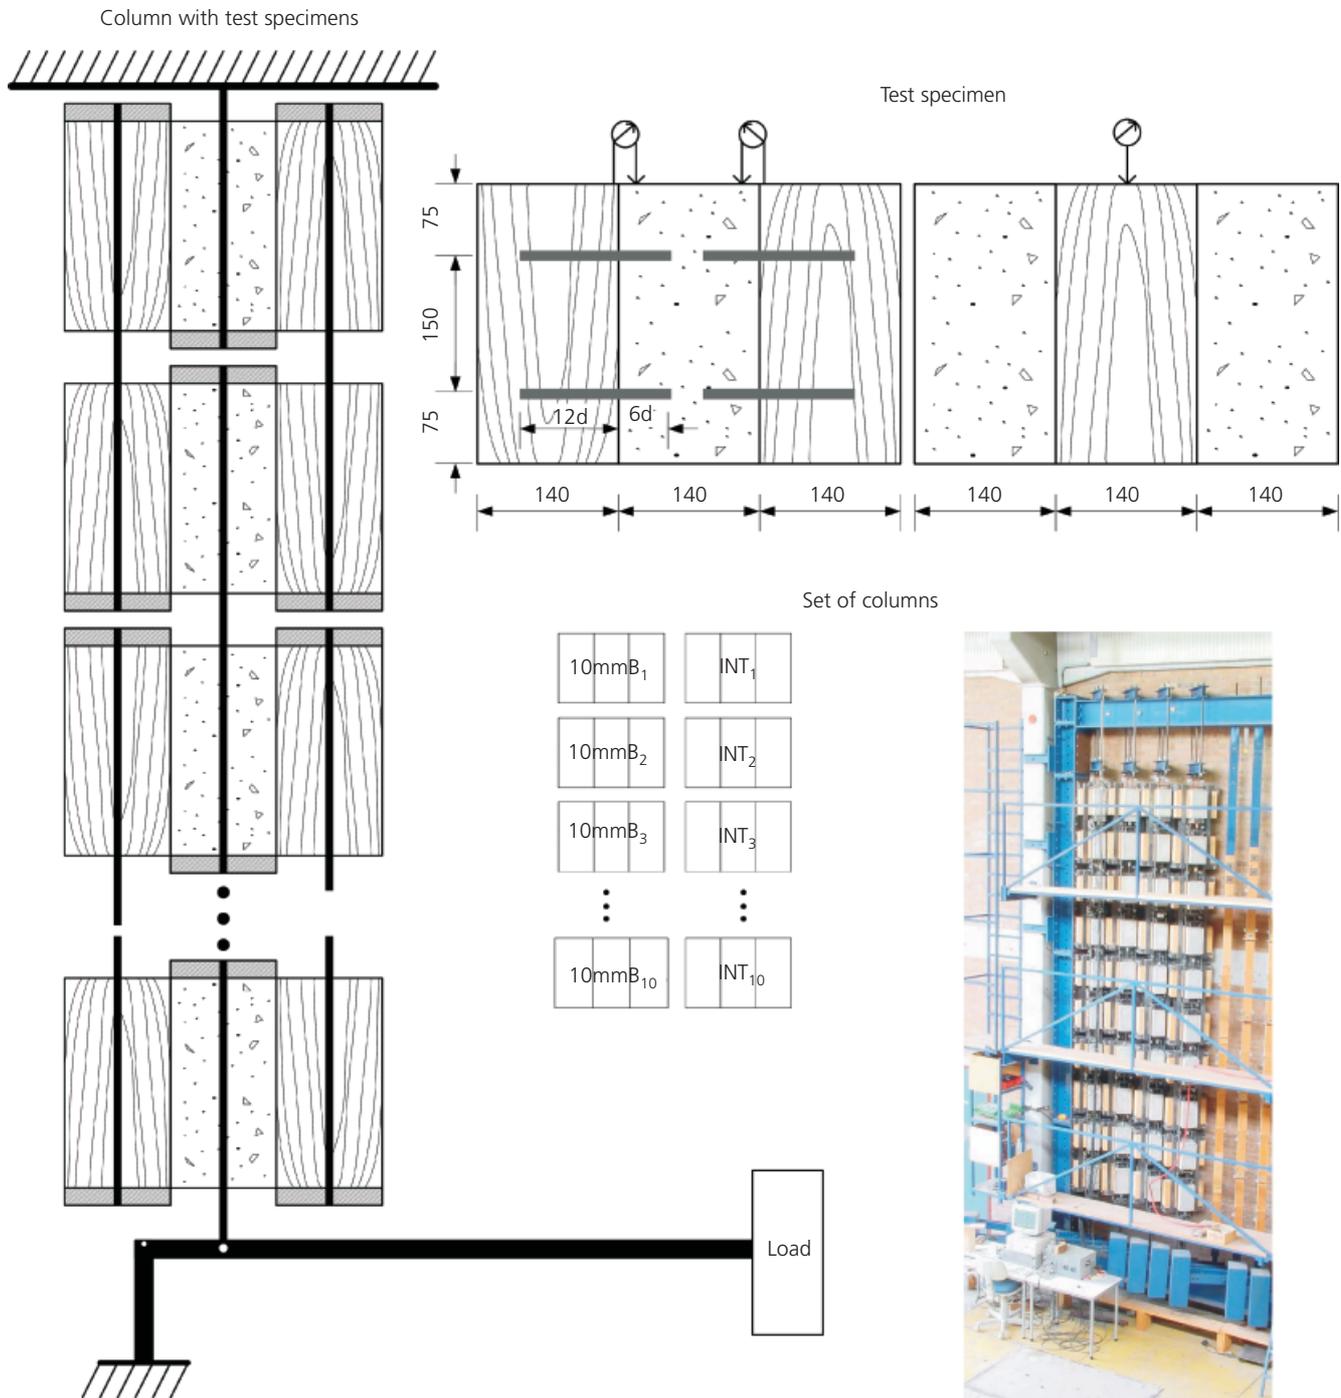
Test setup in uncontrolled climatic conditions (specimens 10mmB and INT) (dimensions in millimetres)
